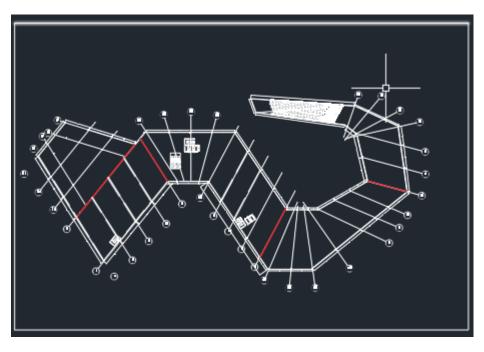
STRUCTURAL GROUND FLOOR PLAN
